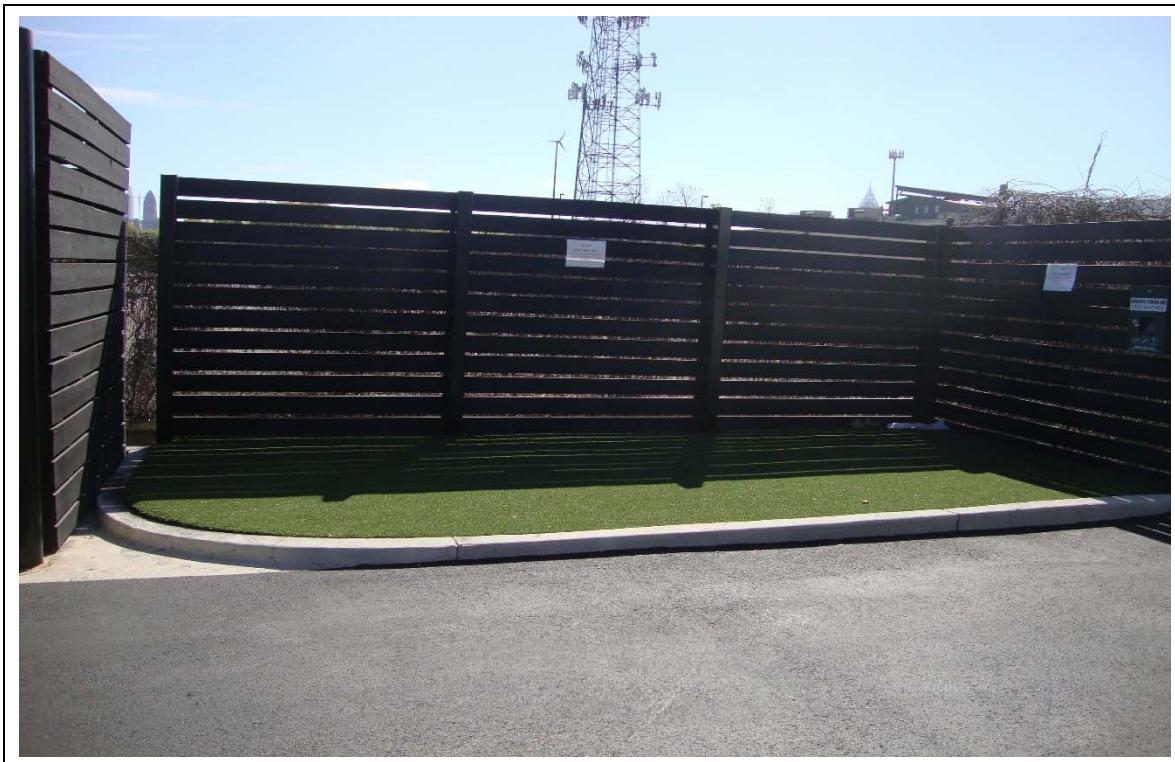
Artificial turf over concrete in dog walk at southeast corner of Site.
